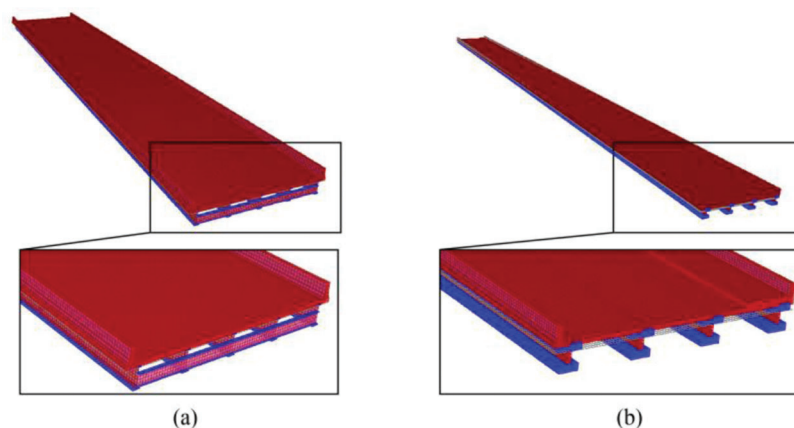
3D FE numerical models in CSiBridge: (a) two-span continuous steel girder bridge, Asset 020-20-07229 and (b) six-span continuous prestressed girder bridge, Asset 331-71-08732.
